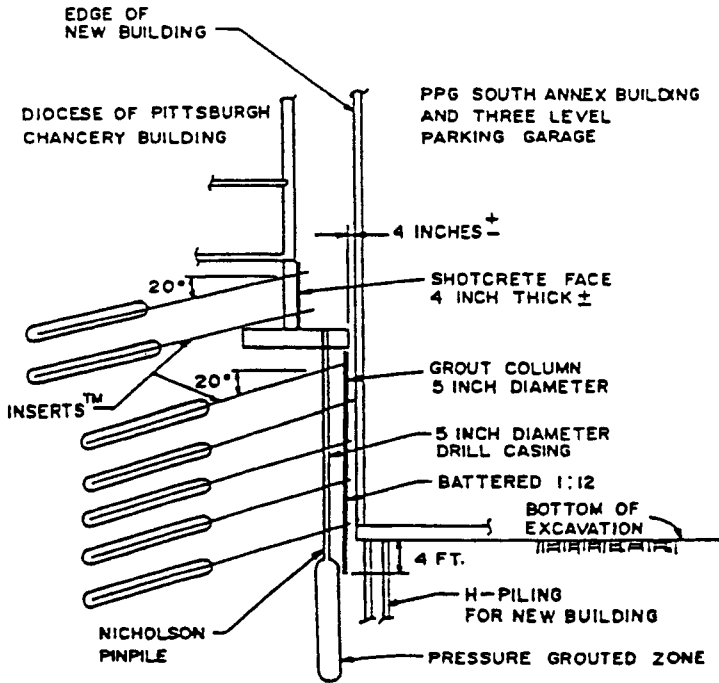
Lateral bracing for an open cut excavation. (From Nicholson, 1986.)
